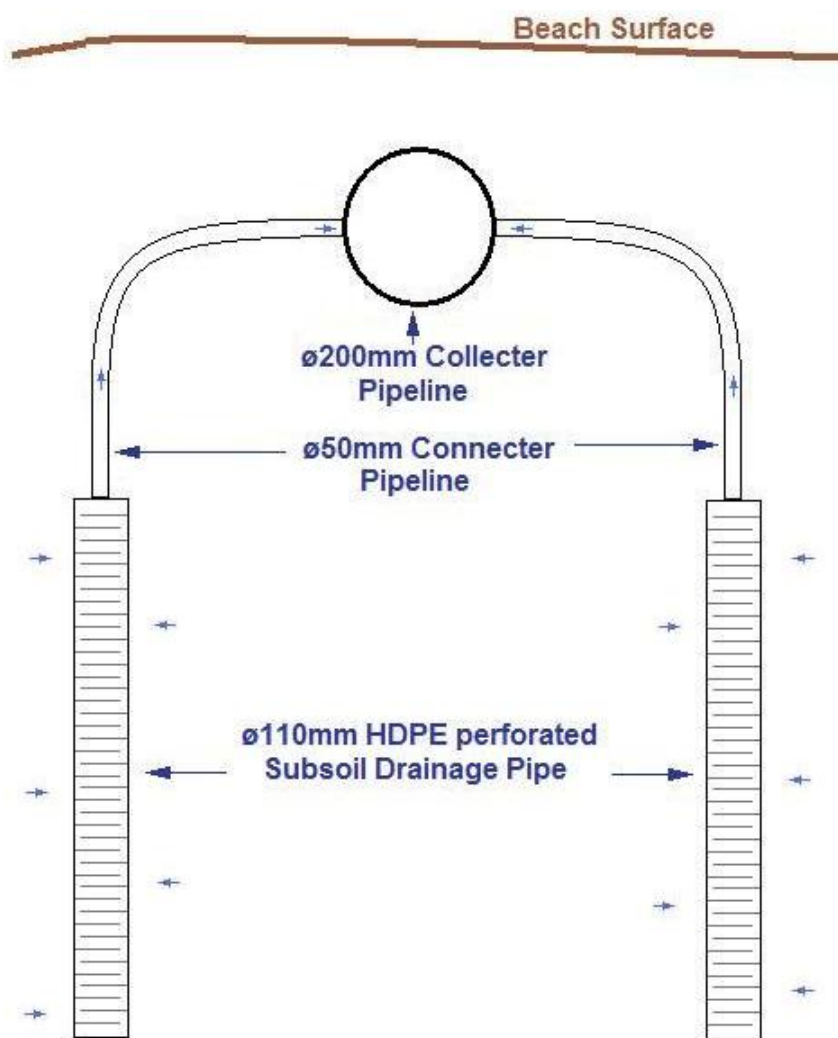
Paternoster Oyster: Sectional Elevation - 2No. Beach Well Subsoil intake units
